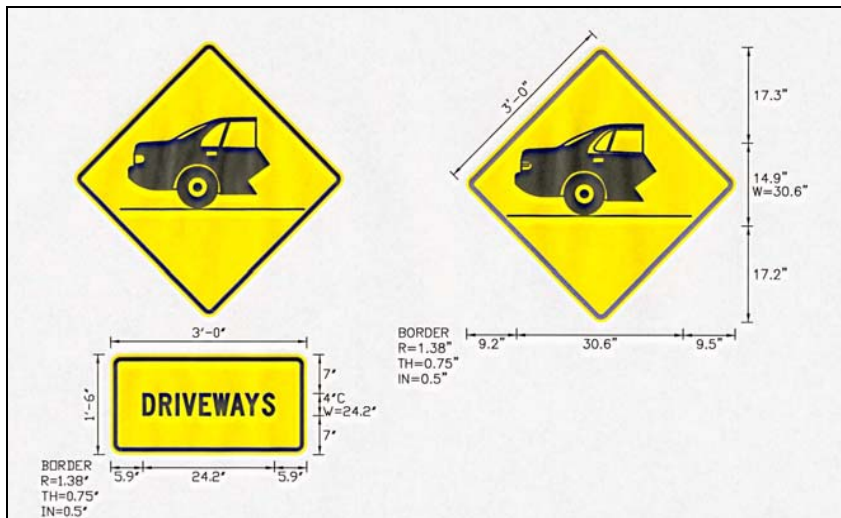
Longer-term solutions: signage to be installed along Noyac Road.
